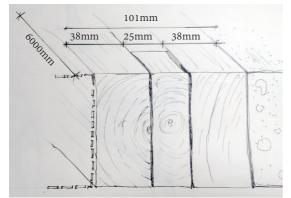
Detail Shuttering detail to formulate concrete blocks
